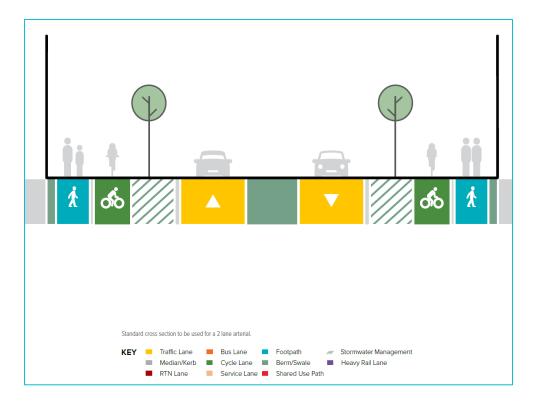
Generic 24m wide cross section is proposed with two lanes for general traffic and active transport facilities on both sides of the corridor.
